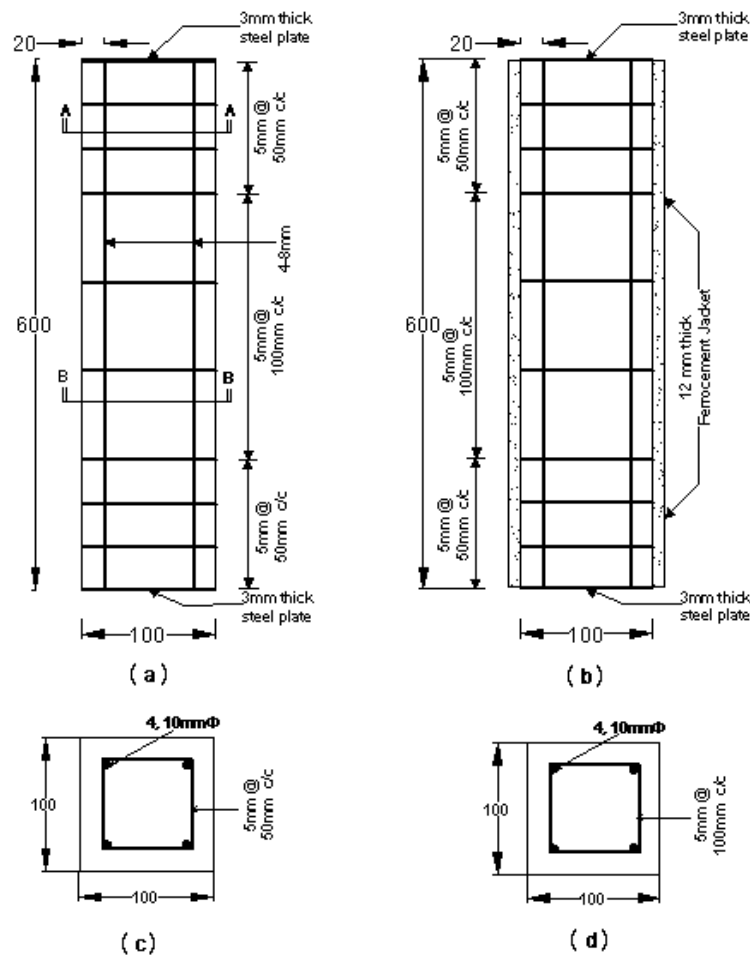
Column specimen details, (a) Non-jacketed column, (b) Ferrocement jacketed column, (c) Section A-A, (d) Section B-B.
